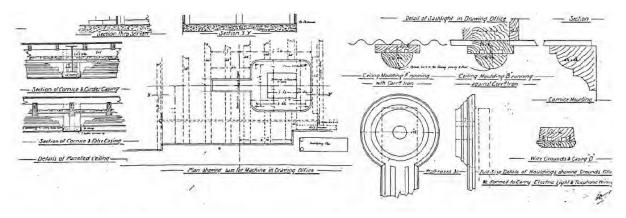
Details of numerous ceiling framing, cornice and bulkhead details as part of the 1900 addition to the CME building. Details of the corrugated iron ceilings for the general officers and pressed metal ceiling for the CME's office. Source:
